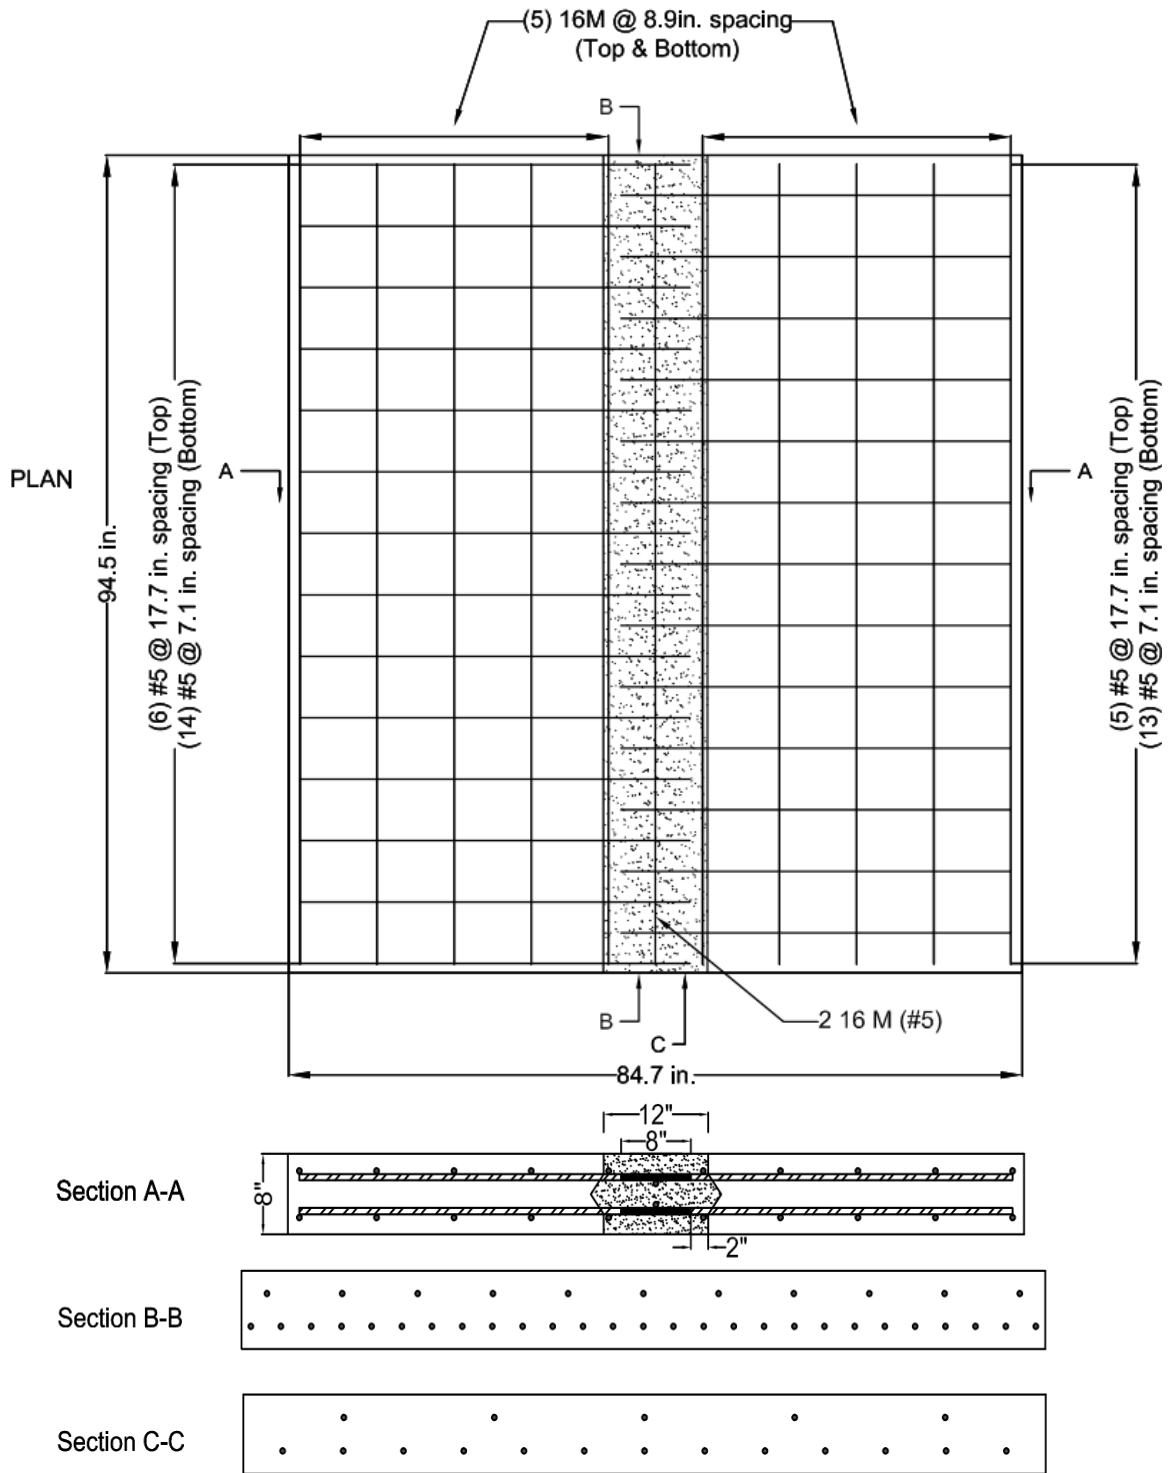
12-inch joint with straight bar details (Model S12)
